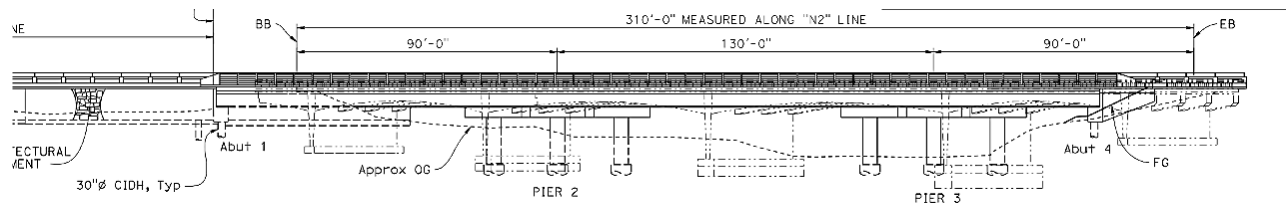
9. Elevation view of draft version of Arroyo de la Laguna Bridge (Preliminary structural drawings by Caltrans)
